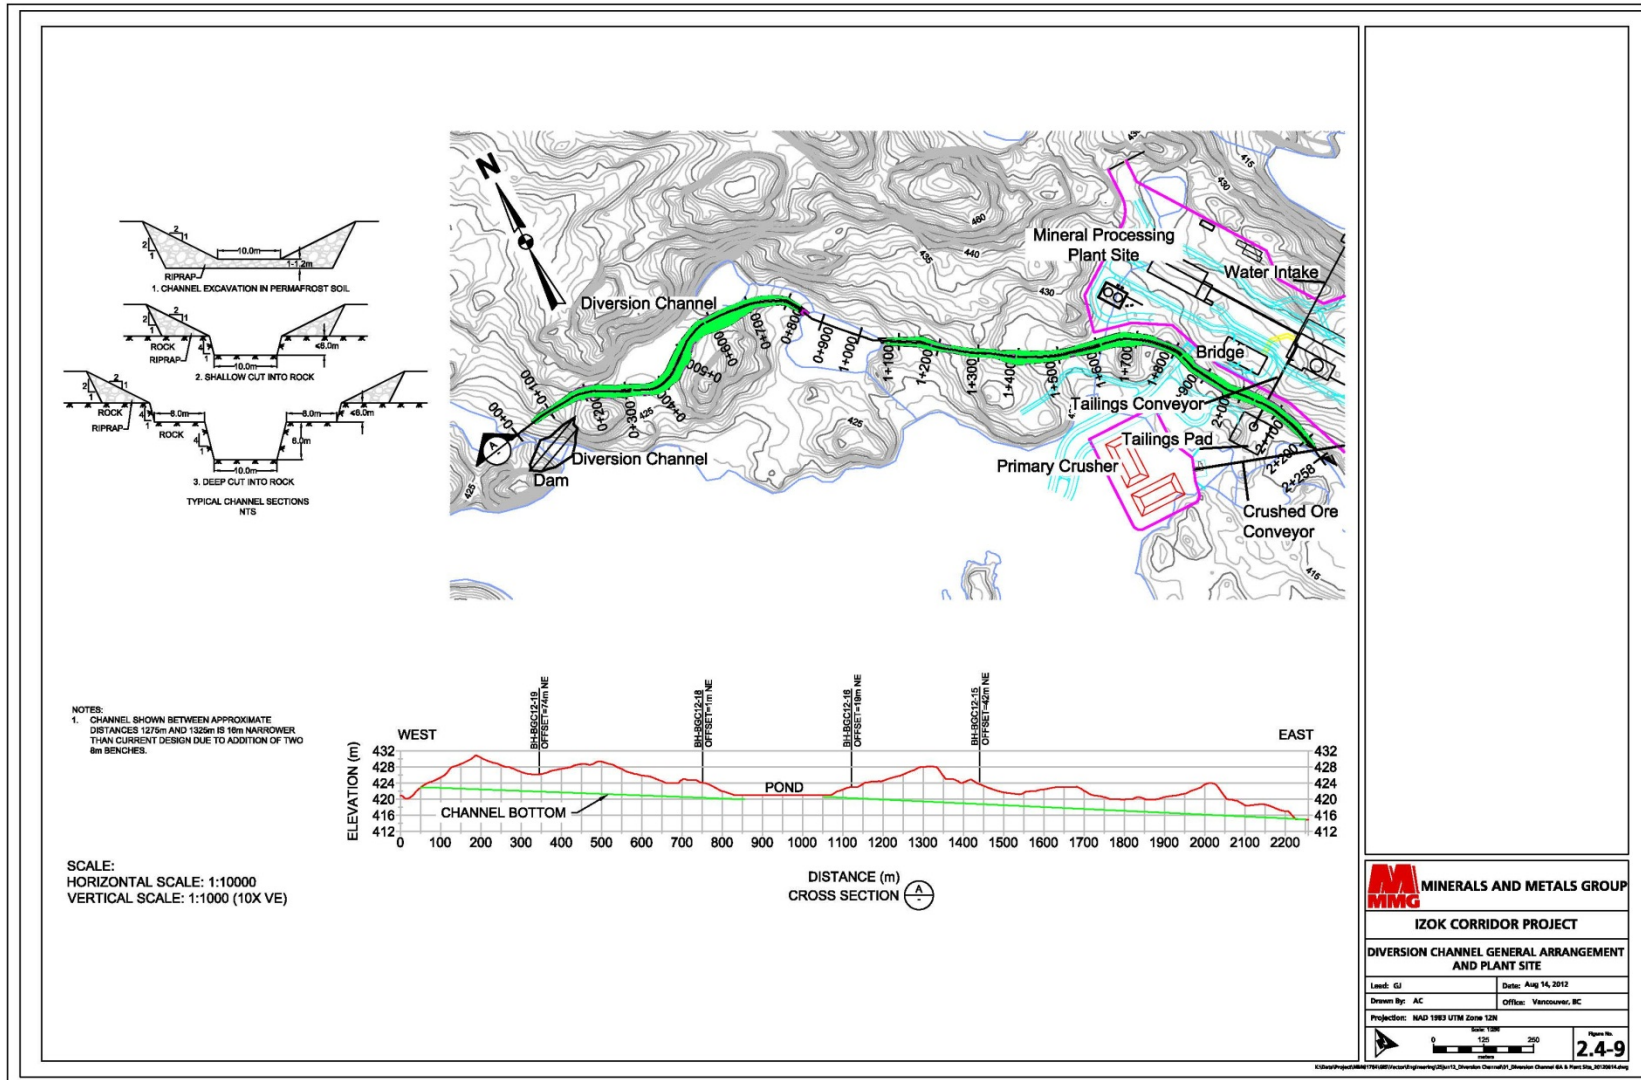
Diversion Channel General Arrangement and Plant Site
